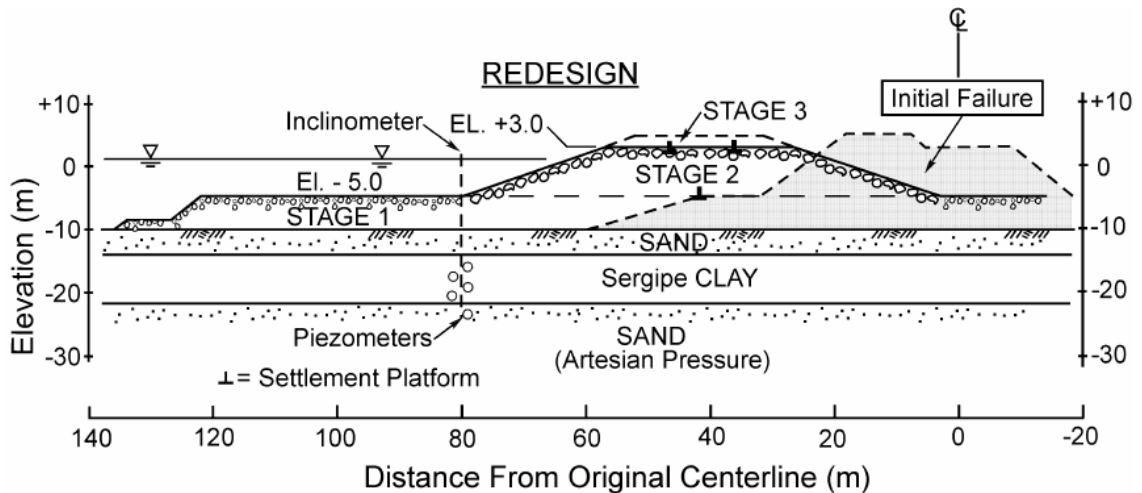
Embankment cross section of Brazilian Sergipe clay redesigned after the initial failure (Ladd and DeGroot, 2003).
